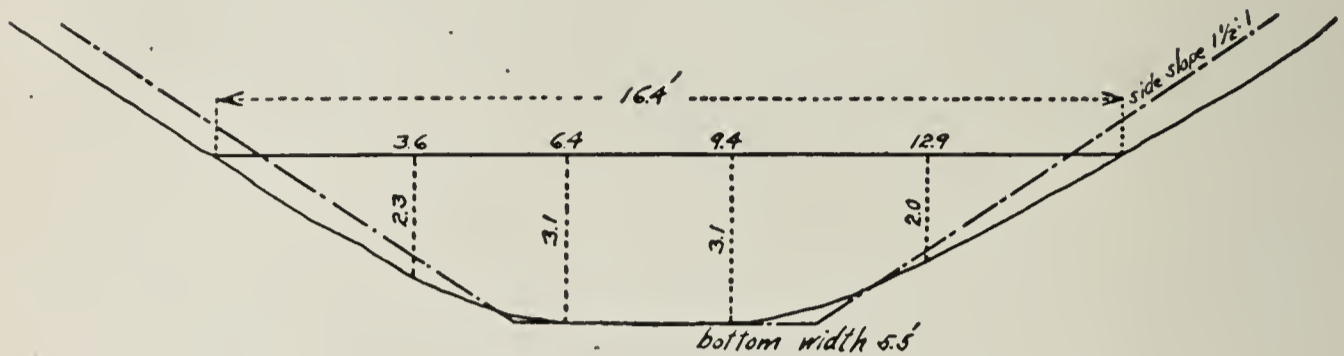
Section (d), Bessemer Canal, Pueblo.
